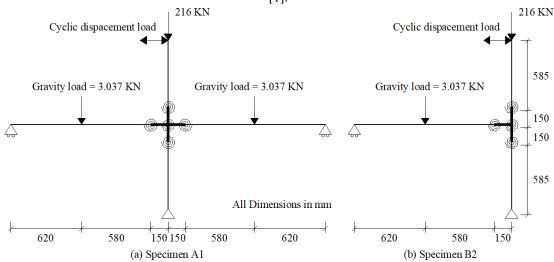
Analytical model for the interior joint A1 and the exterior joint B2tested by Yu [1].
